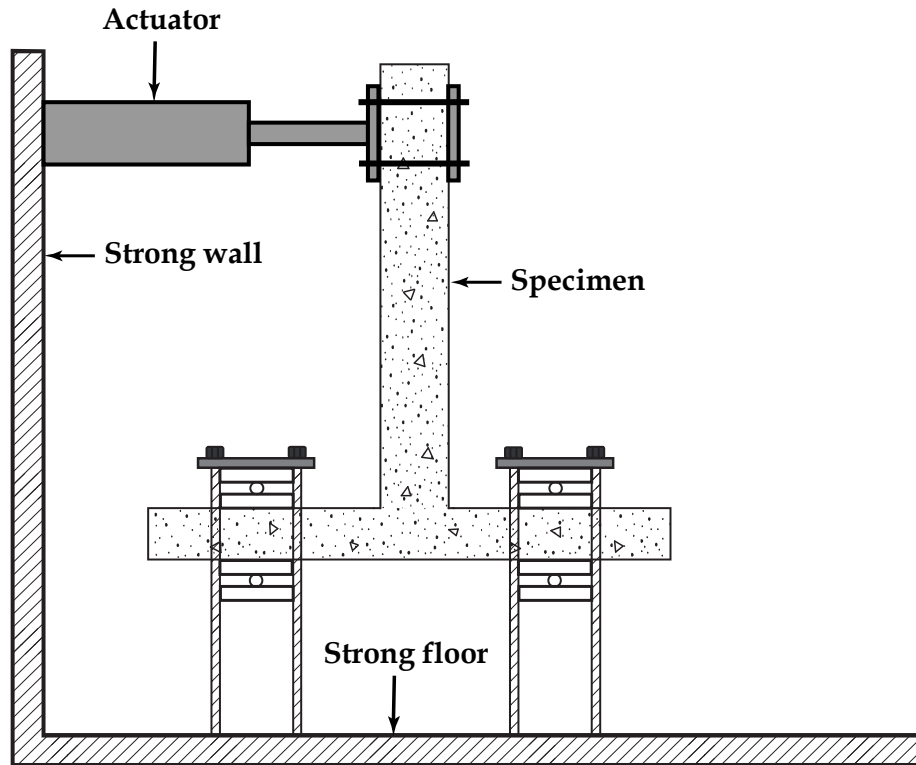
Schematic diagram of cyclic loading set up (MTS actuator) with beam-column joint specimen
